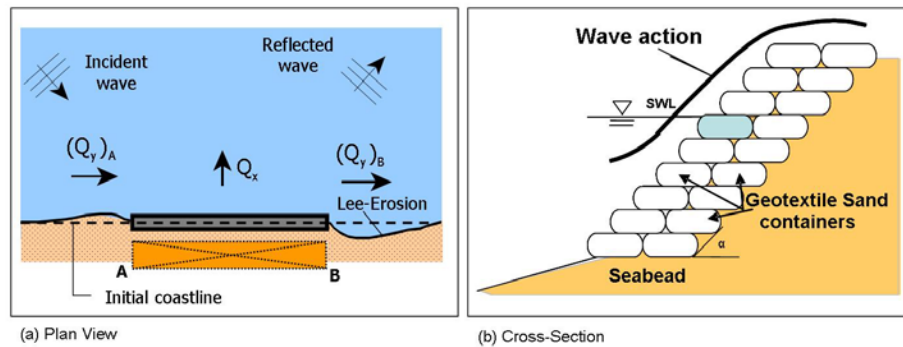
Seawall Made of Geotextile Sand Containers (Principle Sketches)
